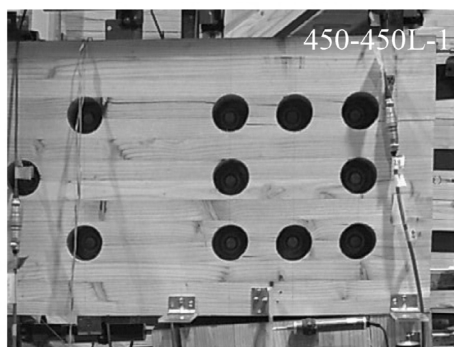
Shear cracks at pre-drilled hole periphery
